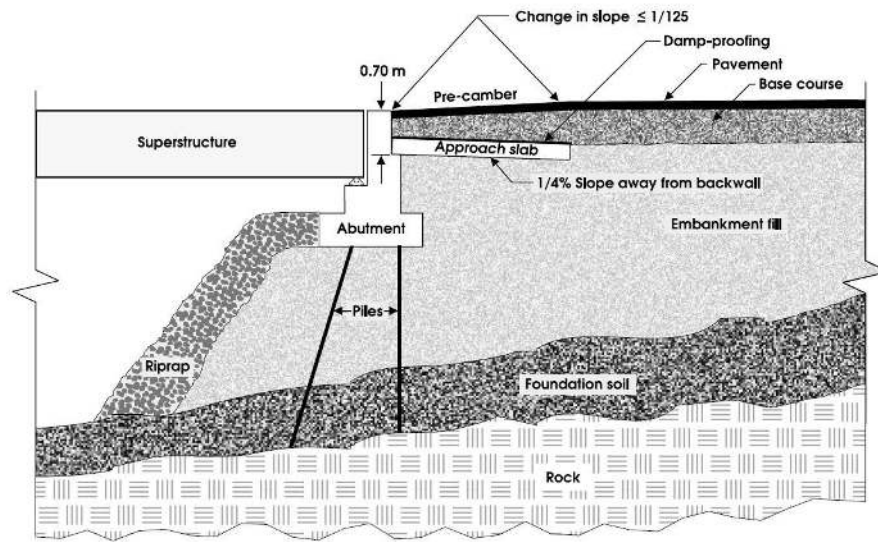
Proposed approach slab configuration (Hoppe 1999)
